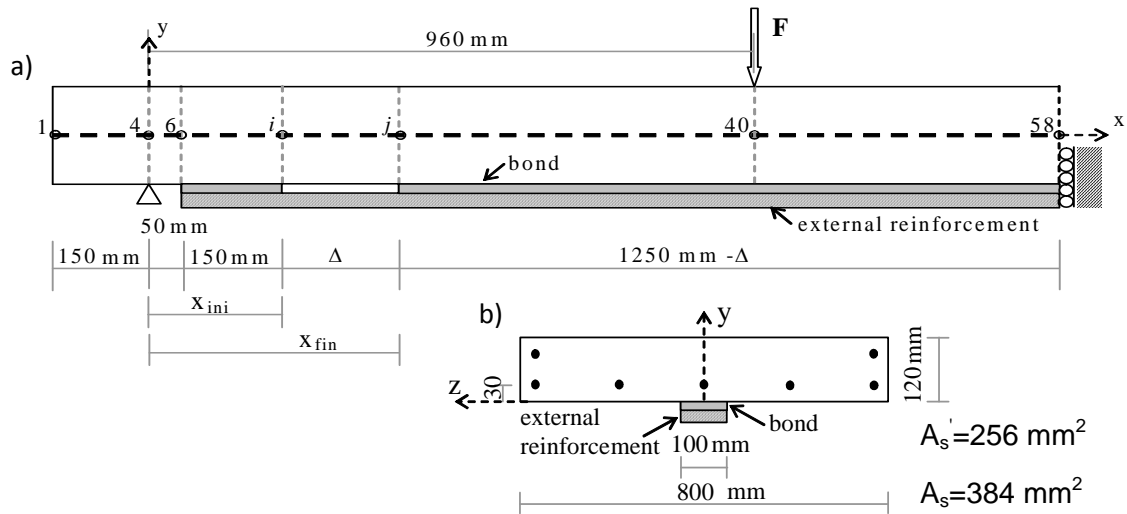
Beam element strengthened with CFRP strip: a) geometry of half beam; b) cross section of the strengthened beam
